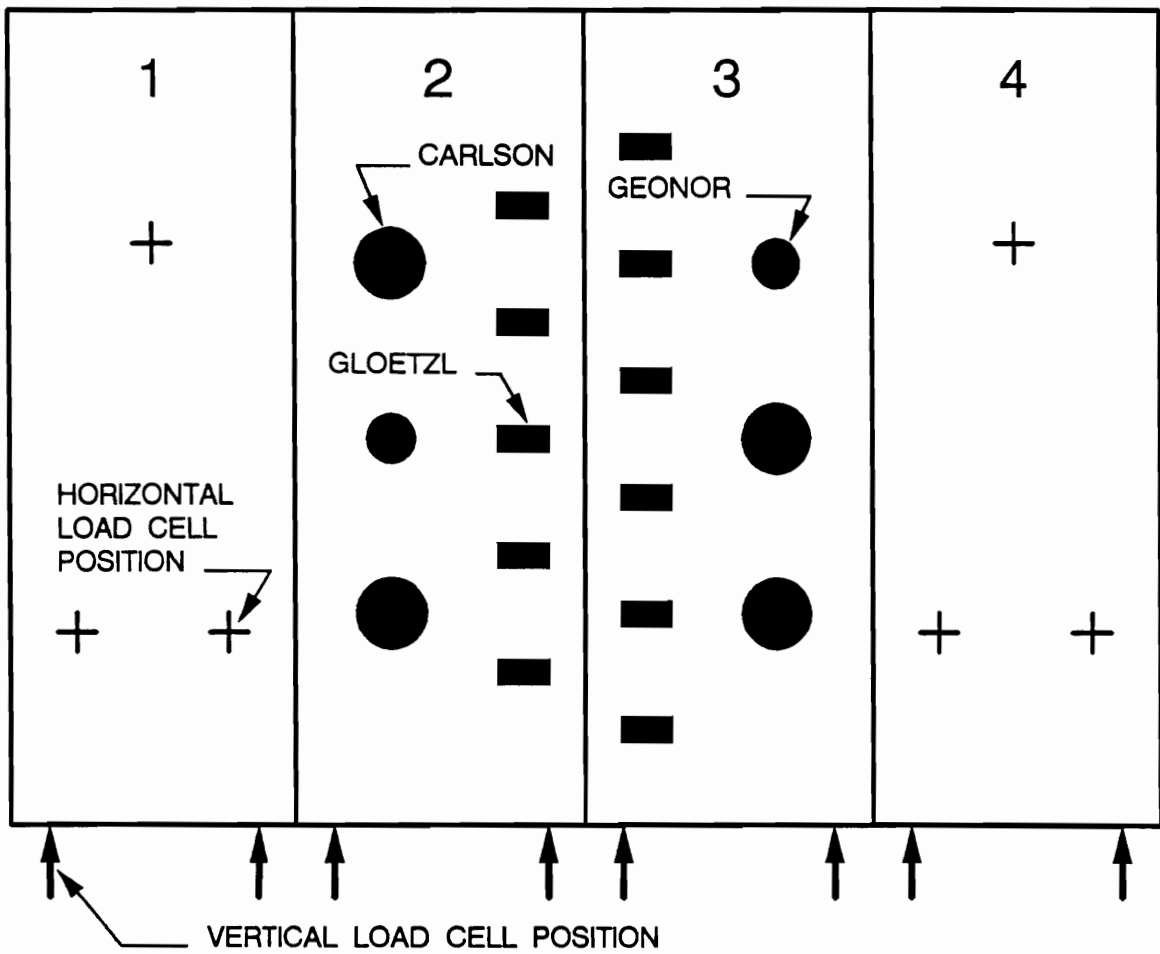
Instrumented Wall Panels of the Retaining Wall Facility.
